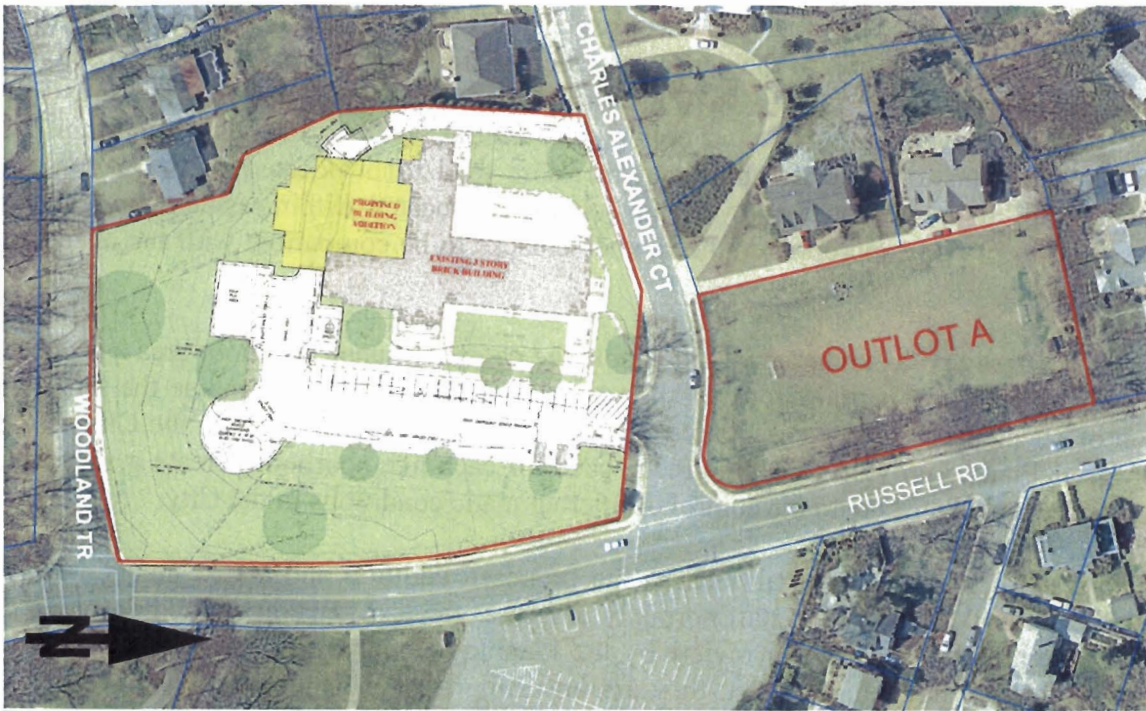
Concept Site Plan for Alexandria Country Day School Expansion (Proposed addition in yellow)
